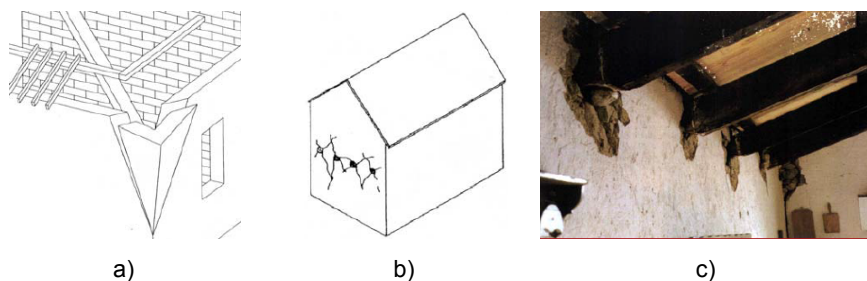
Located failures (Logormasino, 2007): a) Connections between the roof structure and the masonry walls; b) and c) Connections between the floors and the masonry walls.
